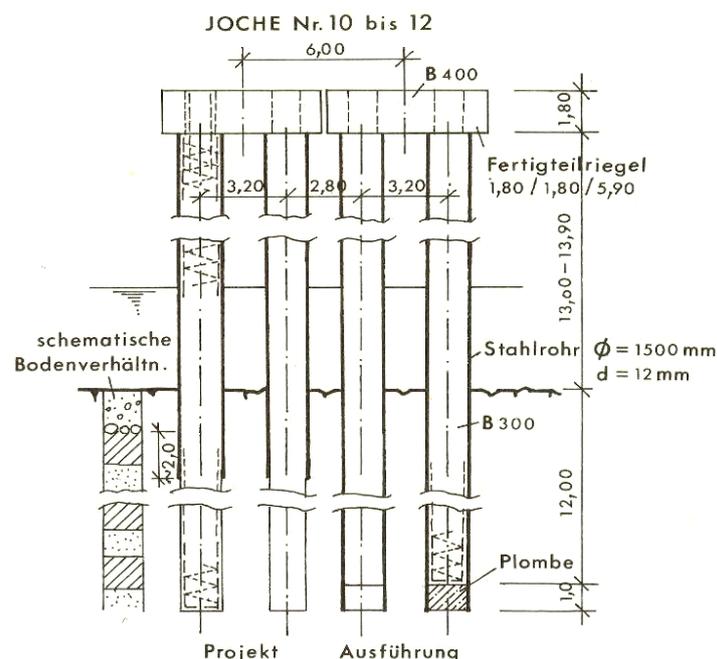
Cross section of the piers for the tram bridges (“yokes” no. 10 to 12), [3]
